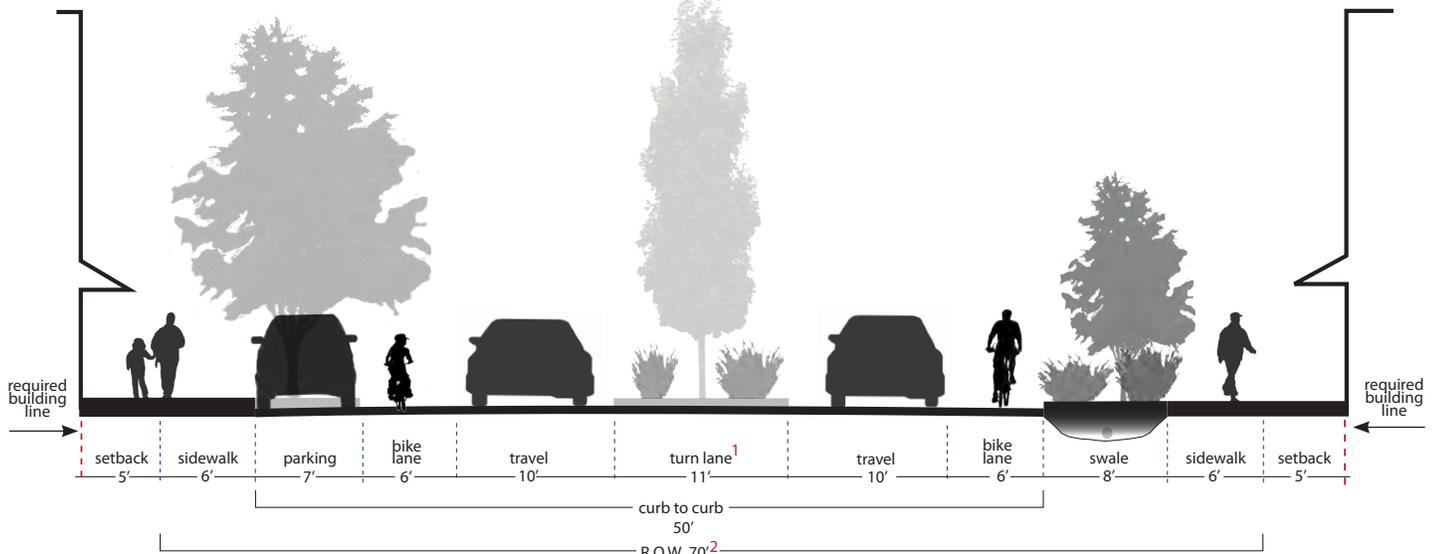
100th Avenue W/N of SR 104 Street Section
